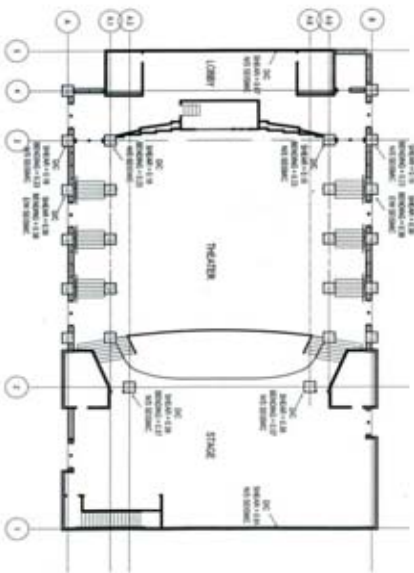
Floor plan of the Alan Harvey Theater. Demand to capacity ratios (D/C) for the shear walls and concrete columns are also indicated.
